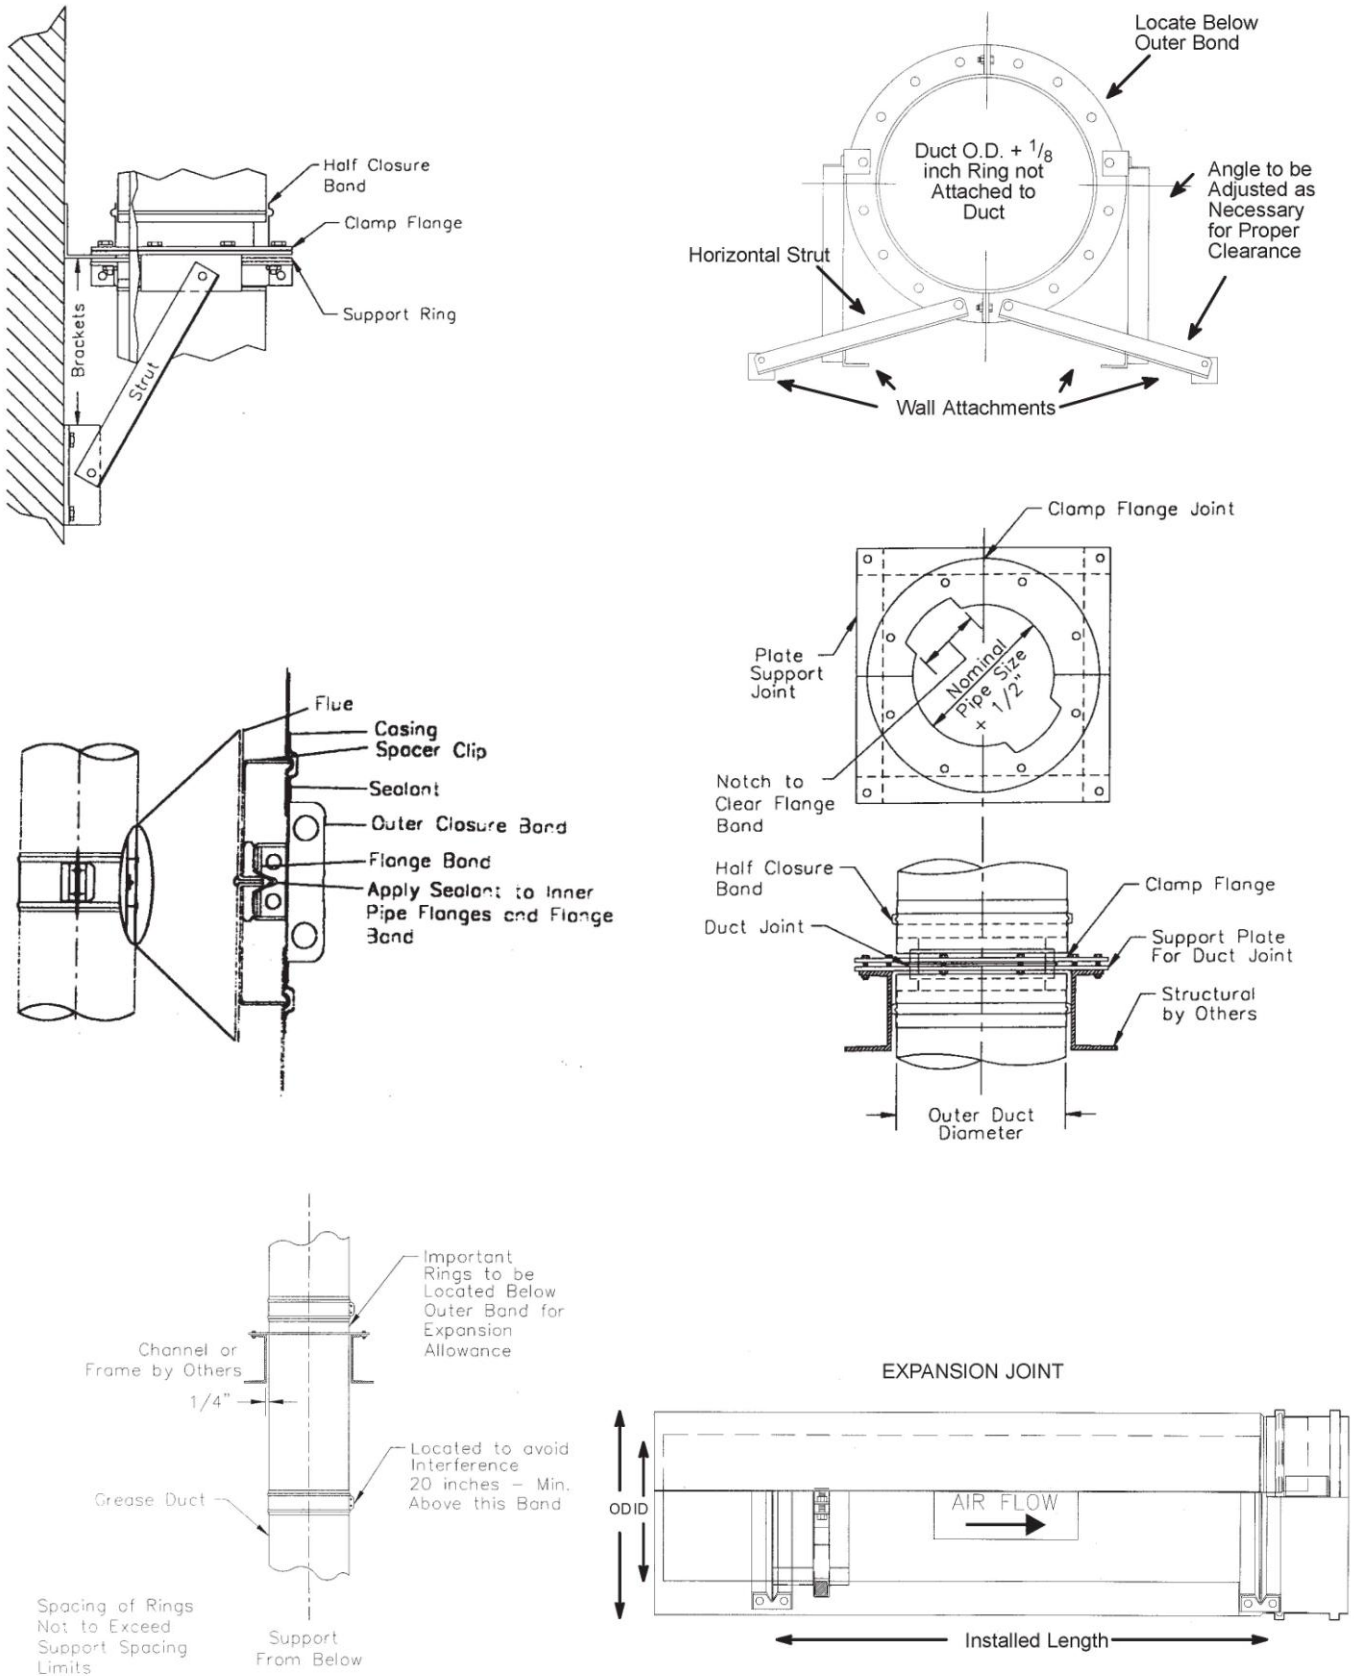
TYPICAL INSTALLATION DETAILS (Continued)
